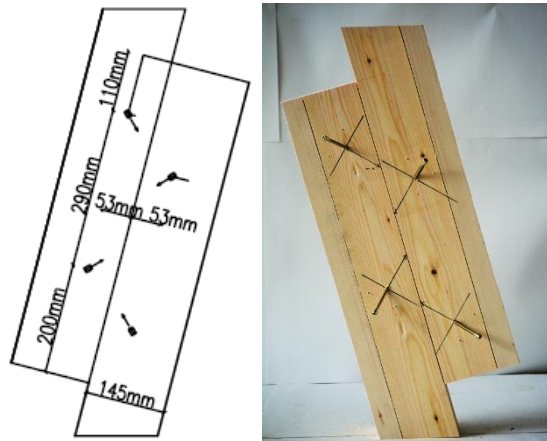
Butt joints with STS in withdrawal (layout and specimen)
